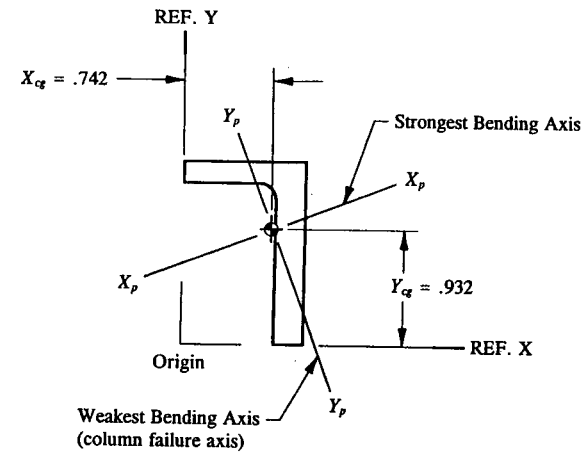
Column failure will occur about the weakest bending axis of the section area.
